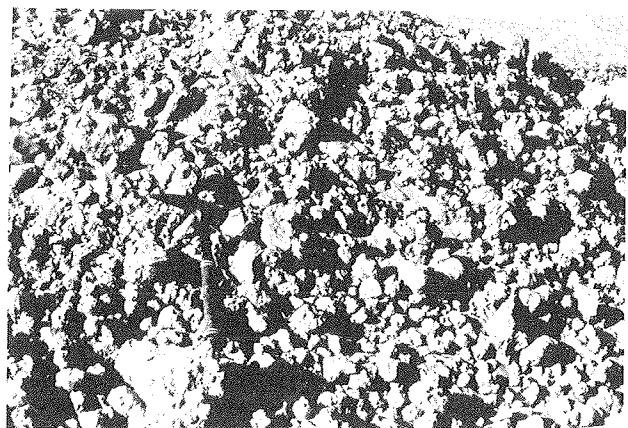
Concretionary silcrete gravel on National Road 1, about 75 km to the south of El Golea.
